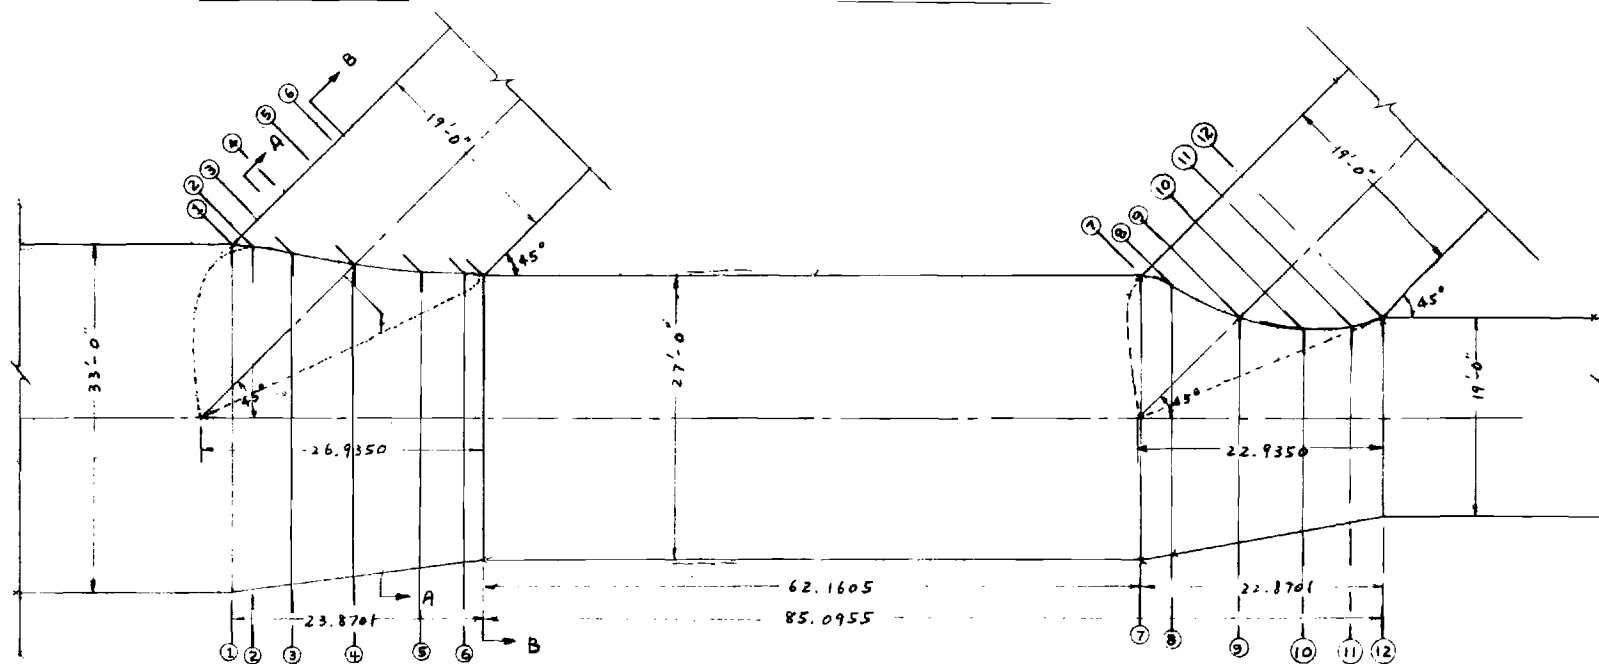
(Contd.) Design Drawings and Model Cross Sections
